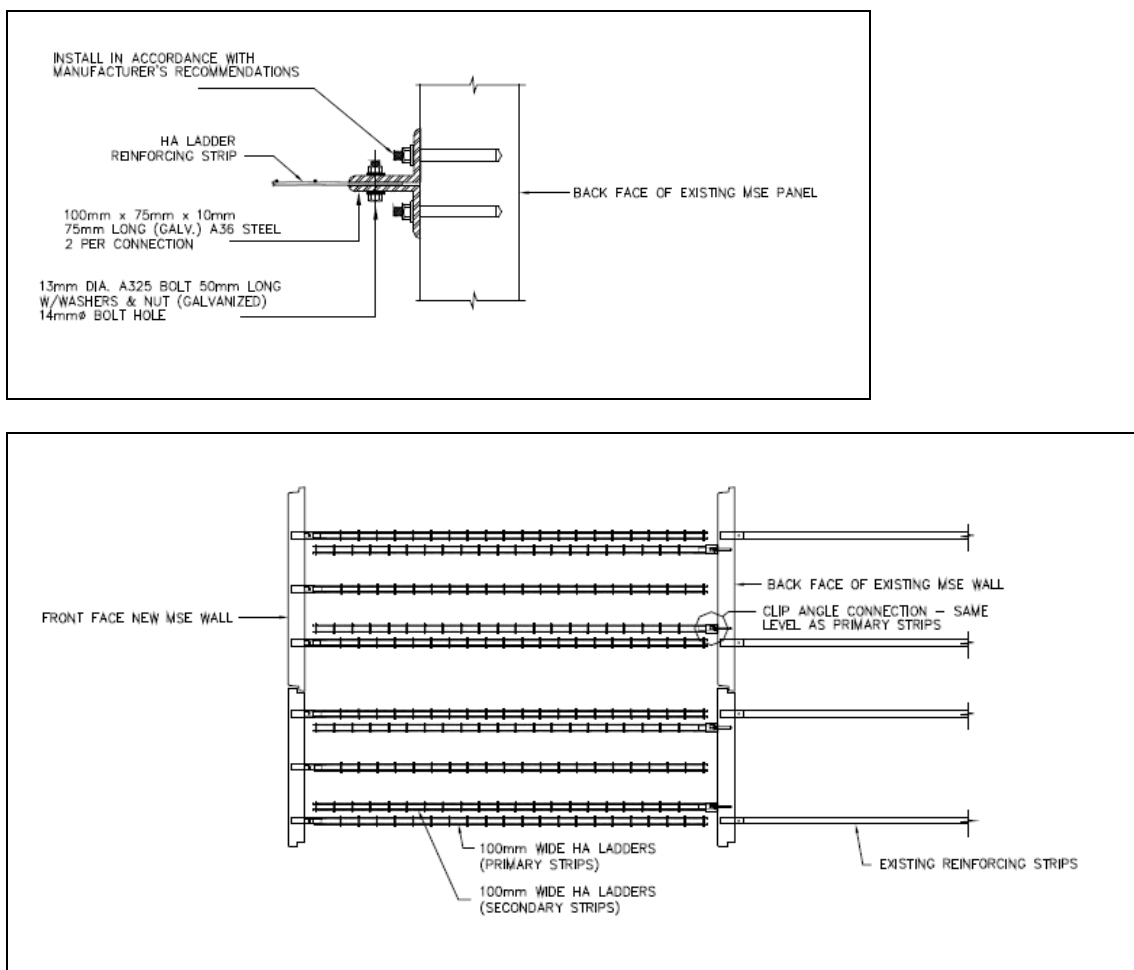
Details showing (a) clip angle connection to existing MSE panels and (b) plan view of soil reinforcement layout (Tavakolian and Grien, 2011)
